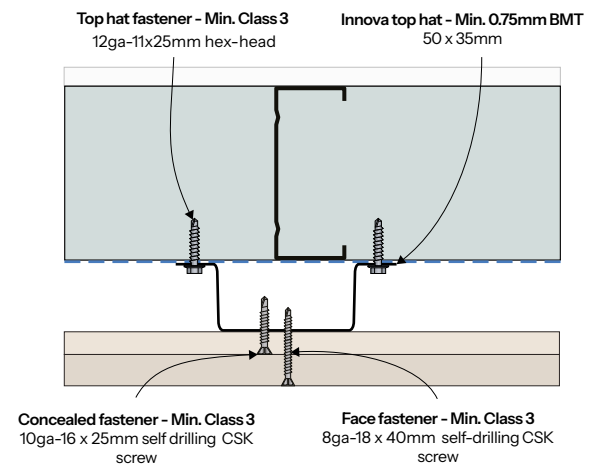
Steel frame - cavity fix (35mm) fastener detail Plan
